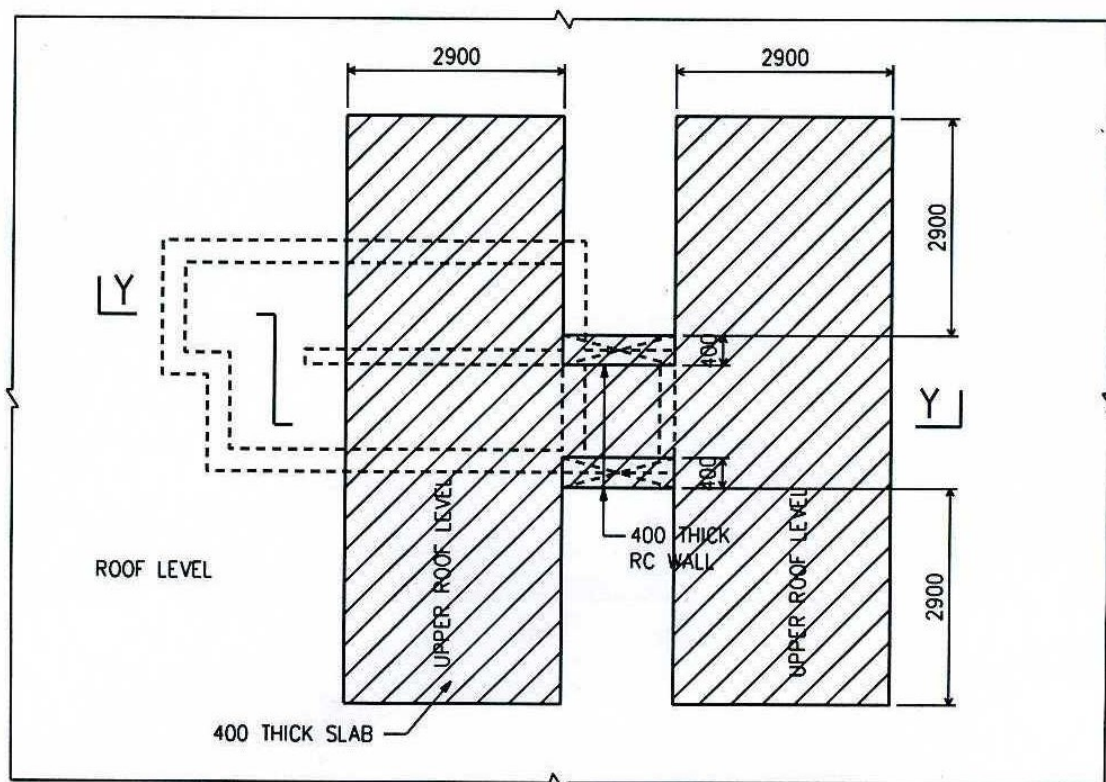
(b-4) PLAN OF STAIRCASE STOREY SHELTER AT UPPER ROOF LEVEL
